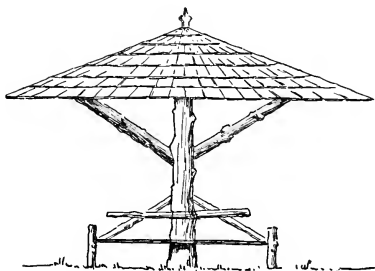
Sketch or elevation of a simple rustic garden seat with shelter
